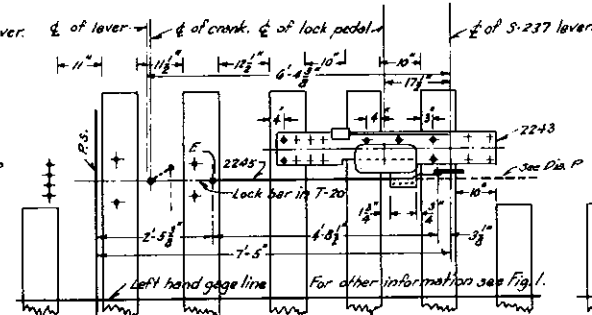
L.H. LAYOUT 18 FT. SWITCH RAIL - 3 HOLE 130 LB. RAIL.
